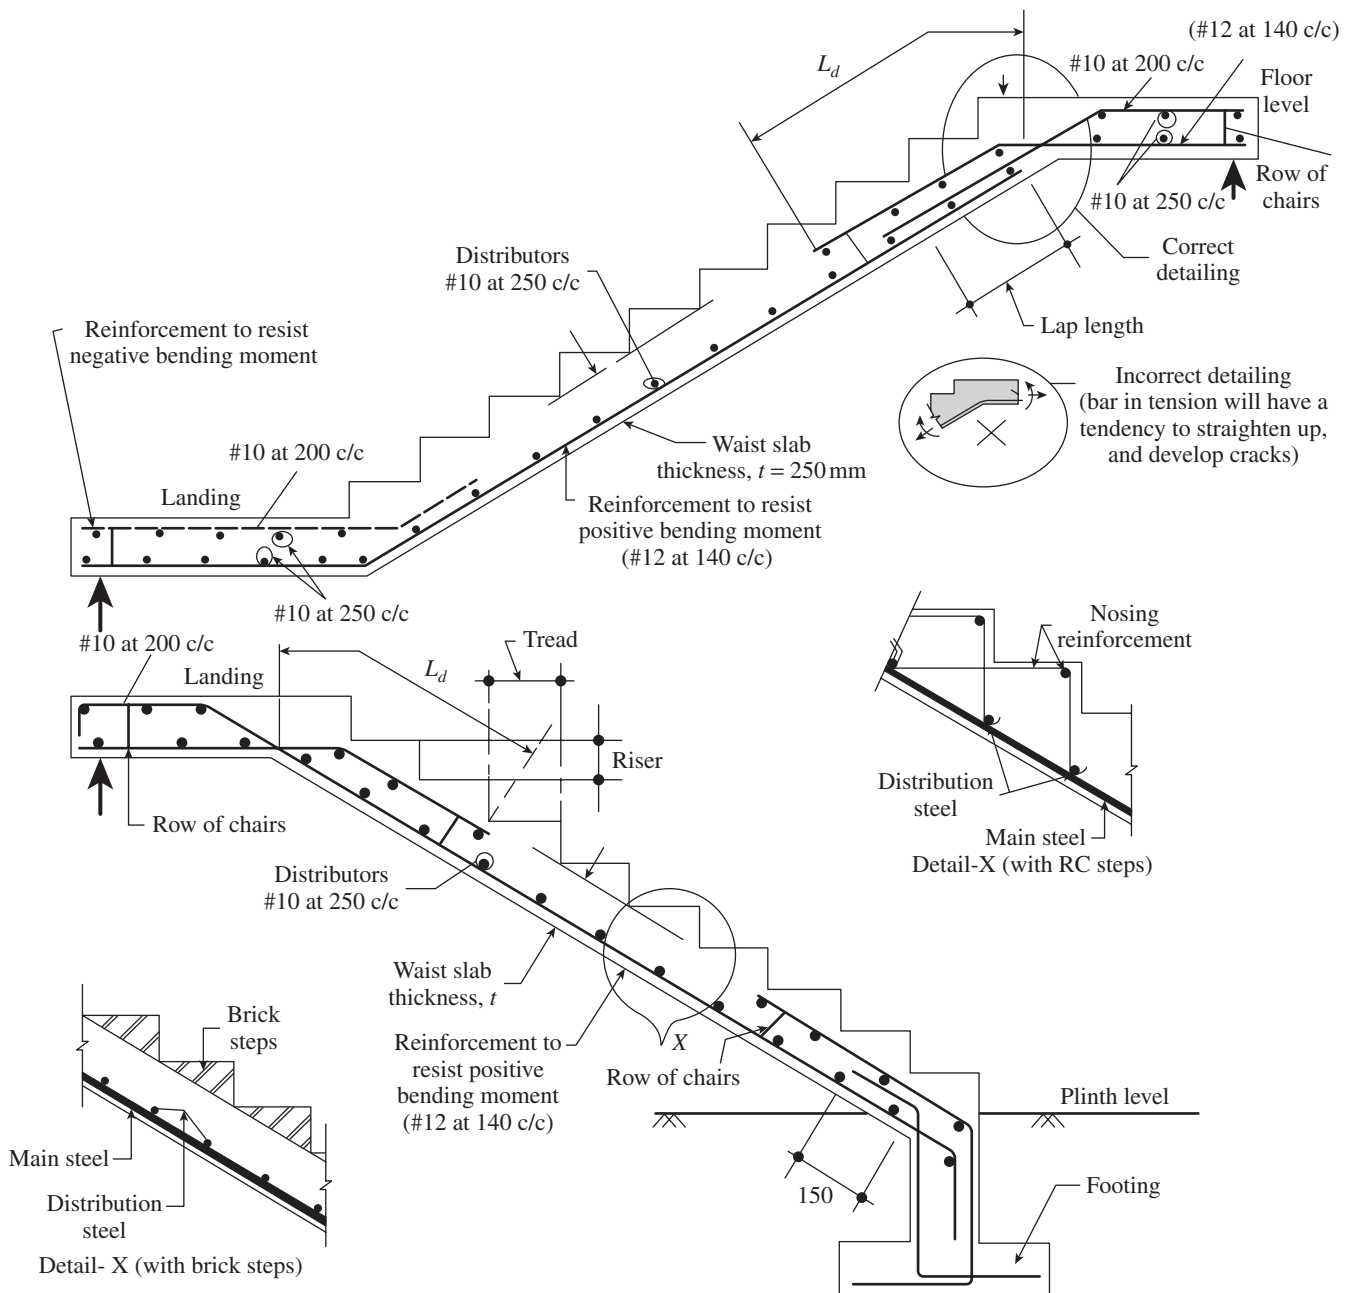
Detailing of dog-legged stair supported at the ends of landing
